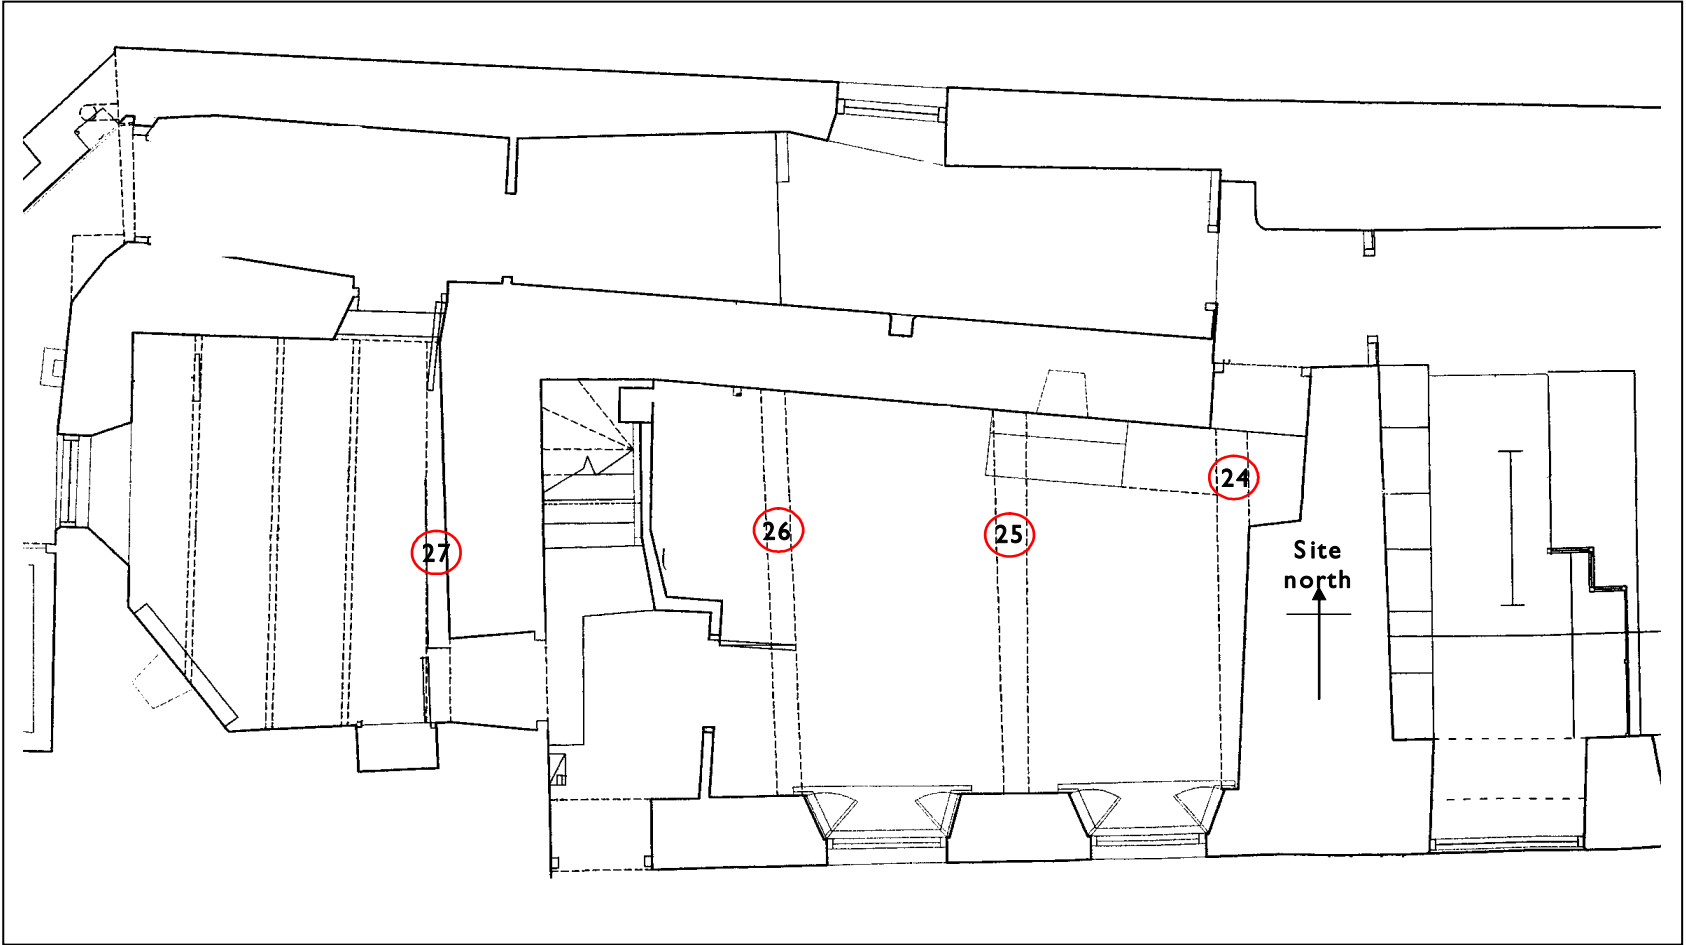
Ground-floor ceiling (living room No 1 The Square) to show sampled timbers (after Peter Ryder)
